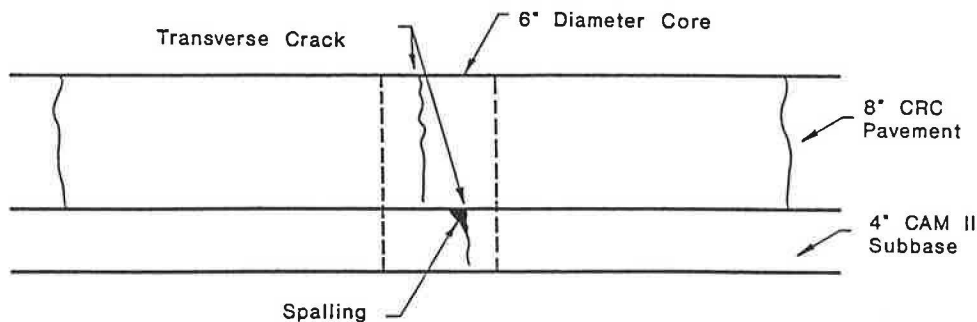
Spalling on crack face of CAM II subbase.
